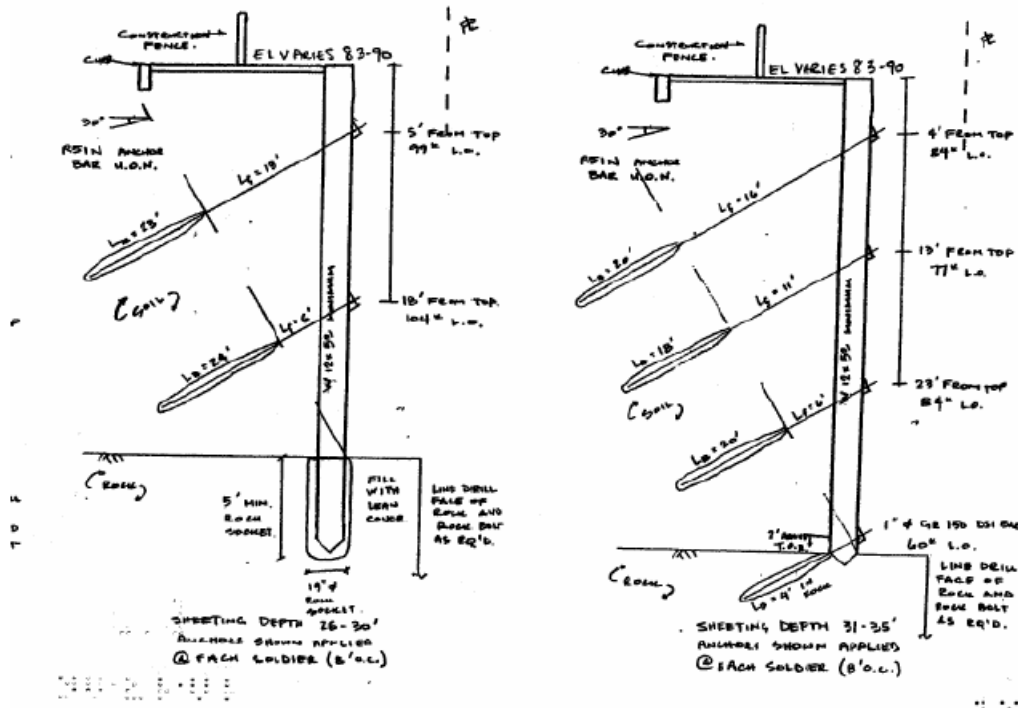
Sheeting Installation (from Drawing No. 2006-45-06s)
